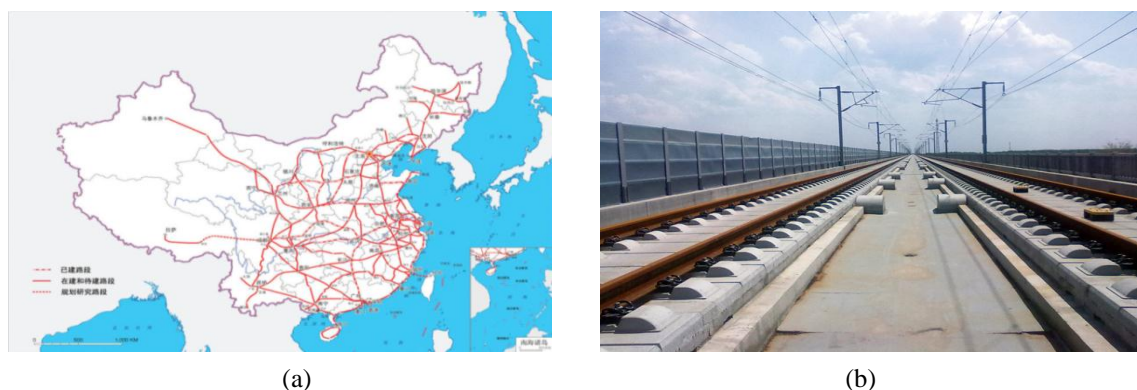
National railway construction, (a) development plan, (c) high-speed railway
